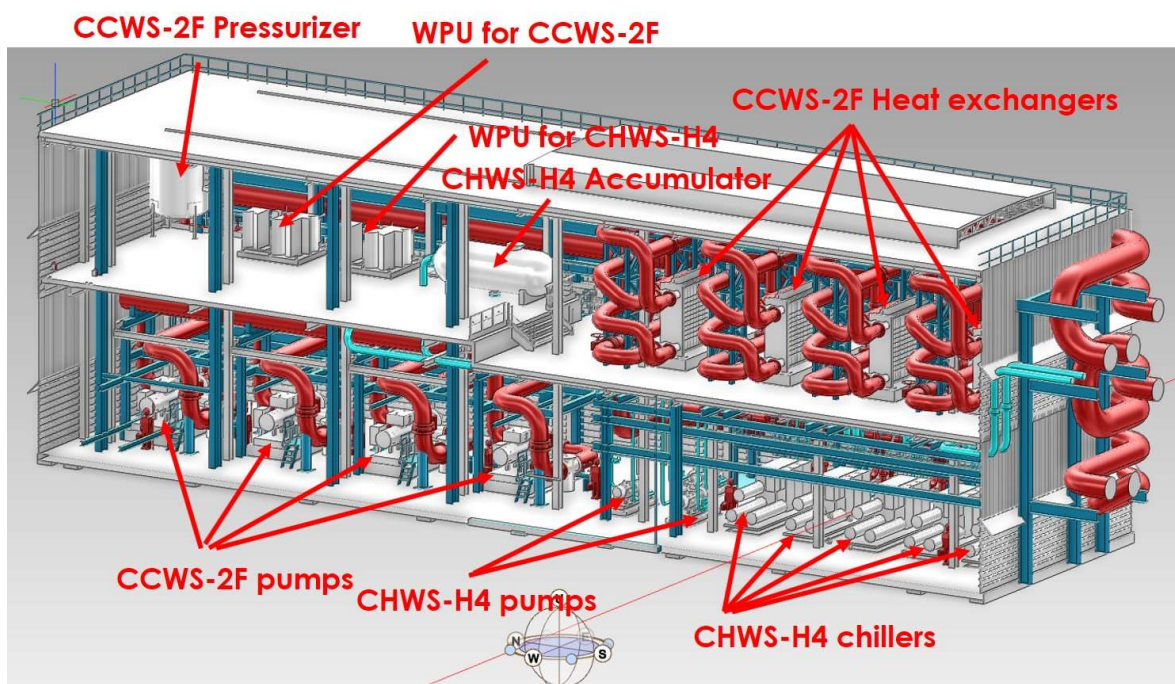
Layout of CCWS-2F and CHWS-H4 in Building 63
